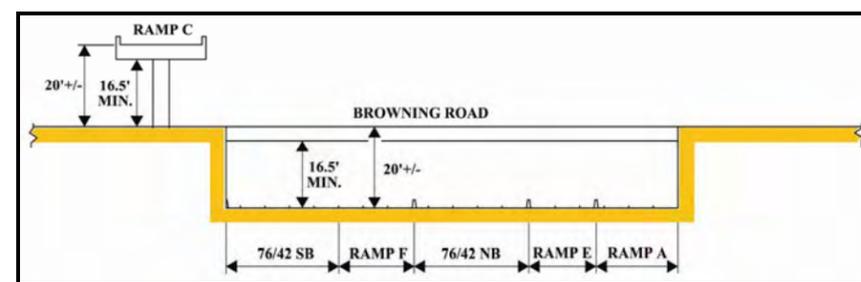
Section A-A at Browning Road (Alternative L)
